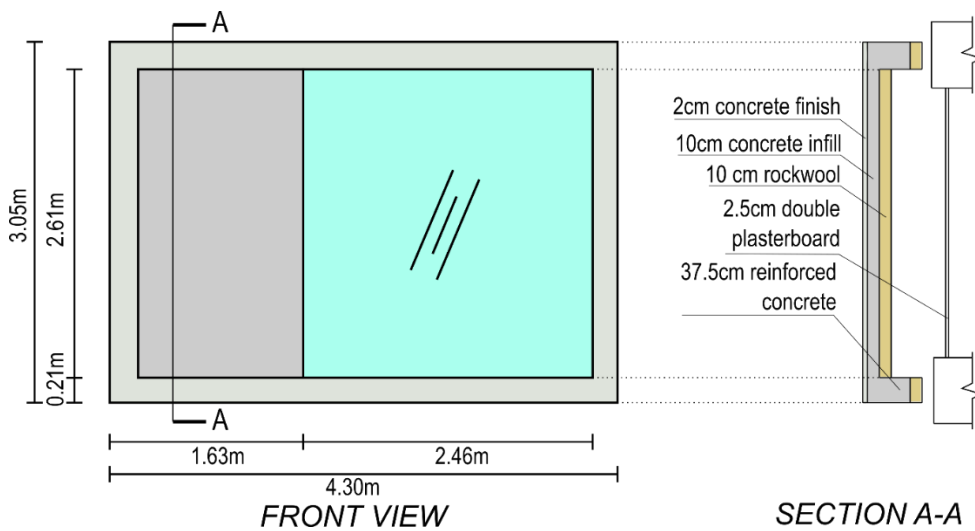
Main frontal dimensions (left) and build-up (right) of the investigated panel
